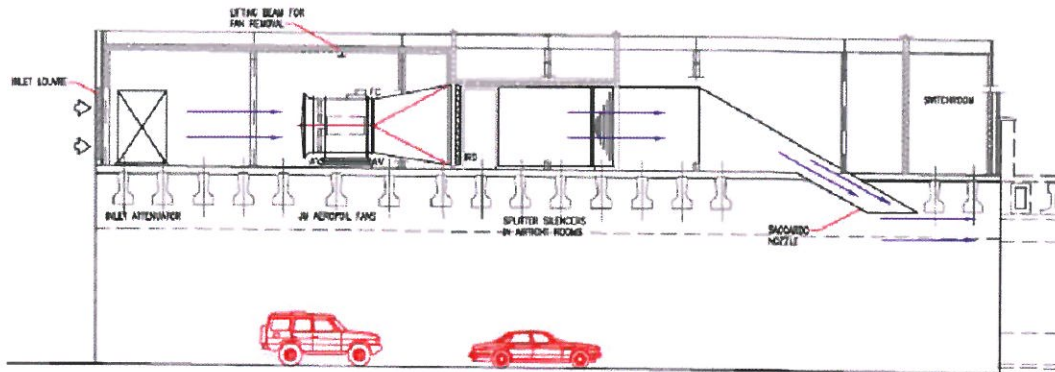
Holmesdale Tunnel Saccardo Nozzle Arrangement (Kenrick, 2008)
